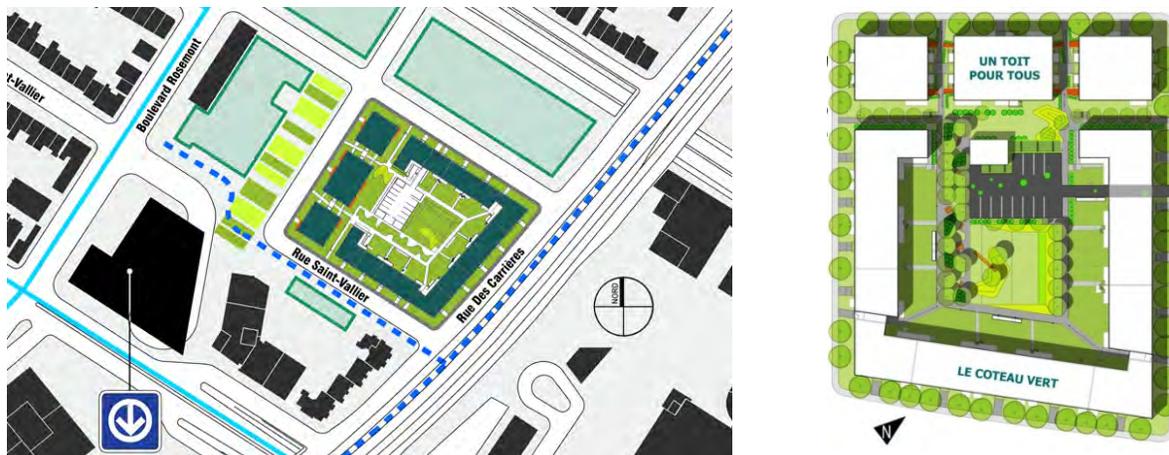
The setting (left) and layout (right) of Coteau vert and neighbouring buildings
